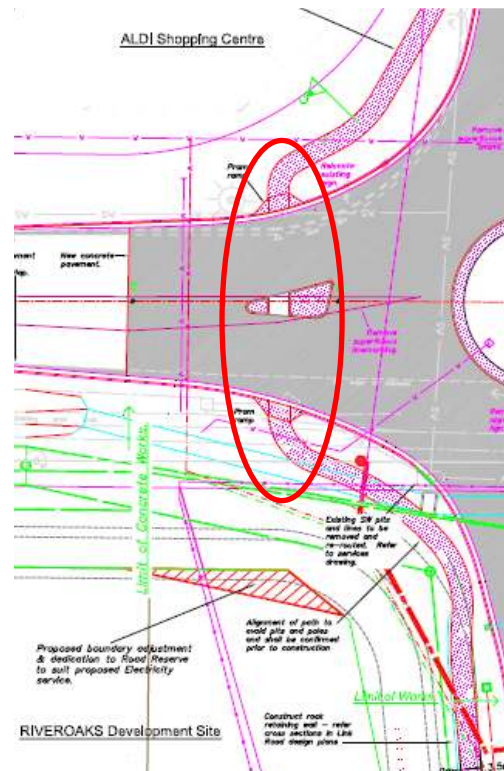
Proposed splitter island facilitating pedestrian access from site to shopping centre (Ardill Payne & Partners 2008).
